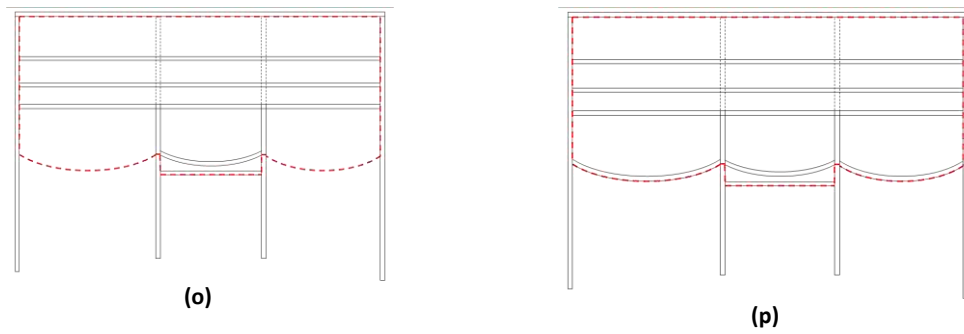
Girona High-Speed Railway Station construction procedure. The dashed red line represents the excavation level. (a) Construction of the external diaphragm walls, the internal mixed pile-diaphragm wall corridor and the upper slab. (b) Central excavation to parking level 1 and lateral excavation to bus station level. (c) Piles demolition between upper slab and parking level 1, central construction of the parking level 1. (d) Lateral excavation to parking level 1. (e) 7.285m of central excavation. (f) Lateral construction of the parking level 1 and central excavation to maximum excavation level. (g) Construction of the central bottom slab. (h) Construction of the bus station slab and pass of the tunnel boring machine through the station. (i) Lateral excavation to parking level 2. (j) Lateral construction of the parking level 2. (k) Piles demolition between parking level 1 and parking level 2. (l) Central construction of the parking level 2. (m) 6.785m of lateral excavation. (n) Construction of the central inverted arch. (o) Lateral excavation to maximum excavation level. In this phase the excavation was carried out by sequences of 12m length to avoid excessive displacements. (p) Construction of the laterals inverted arches in sequences of 12m length. (o) and (p) were alternated until completing the full length of the station.
